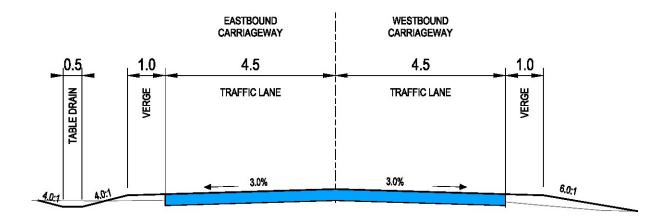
Typical cross section – New link road (eastern section) between Denmark Road and Carlton Street
